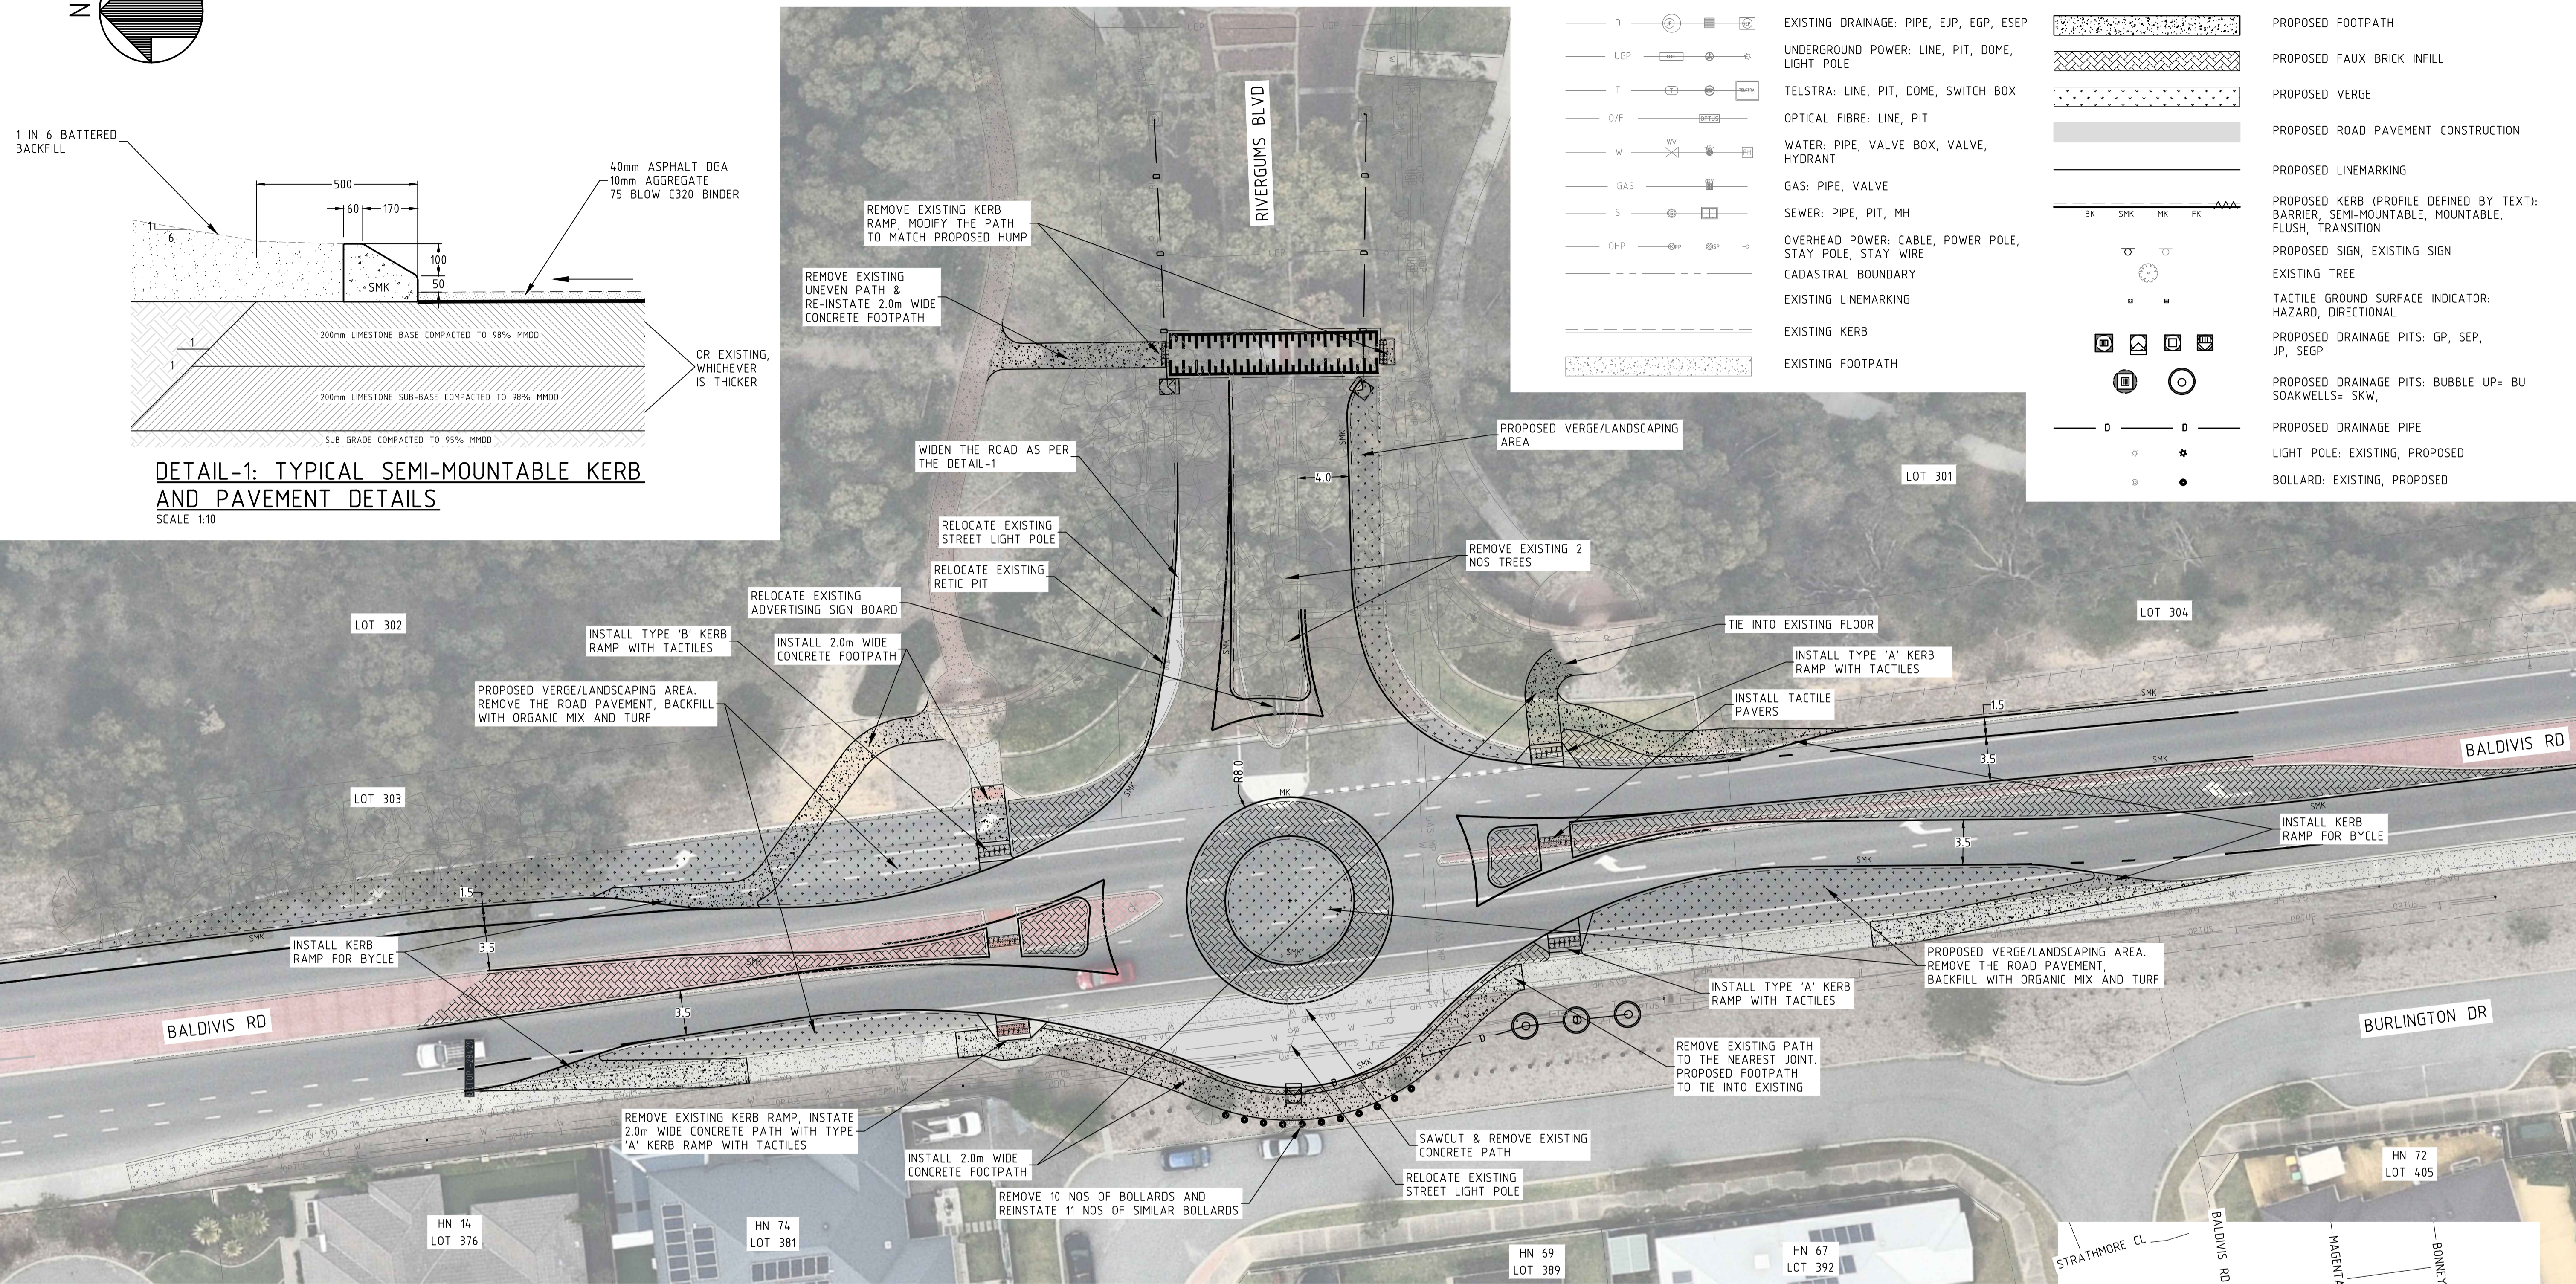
TYPICAL SEMI-MOUNTABLE KERB AND PAVEMENT DETAILS
